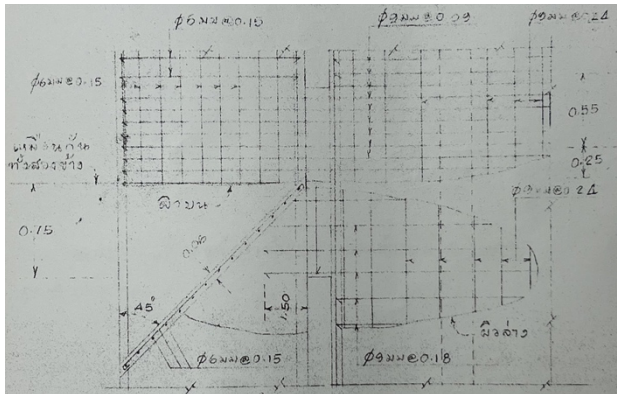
Original structural detail (top view) of concrete fin facade show specification of reinforcement rebar (1967).
